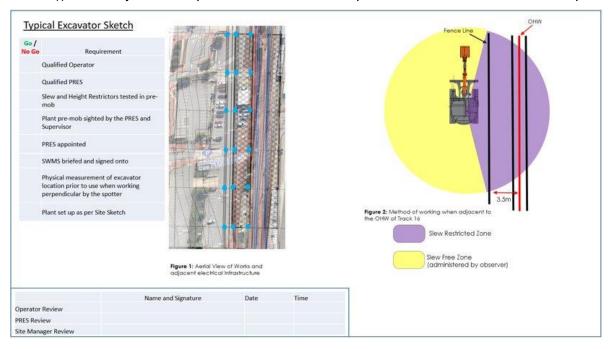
Example of Excavator Daily check sheet to be completed prior to commencement of works
